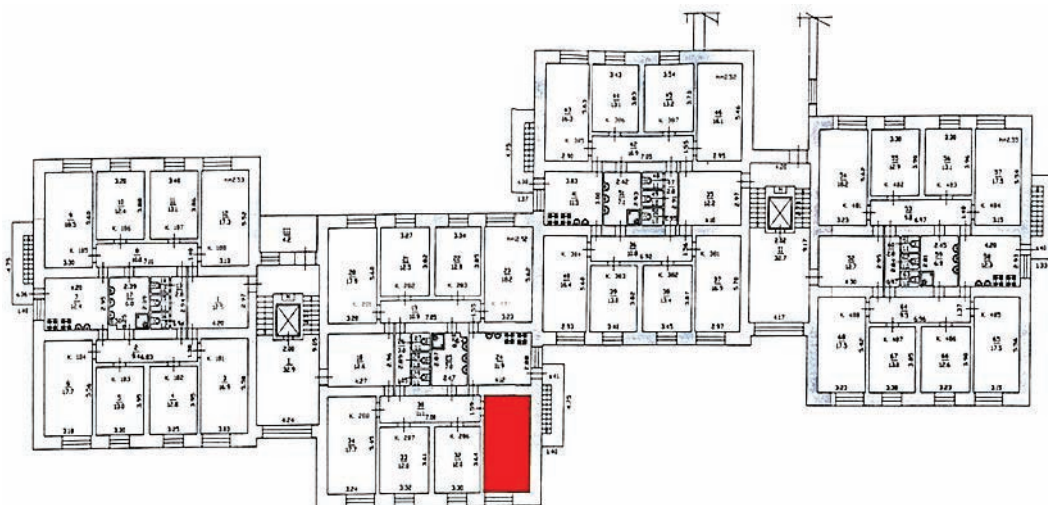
The location of rooms 225, 235, 245, 265 on the floor plan of a typical dormitory (indicated by color).
